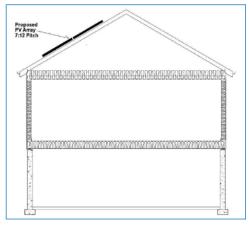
Roof Pitch Detail. The inclination (roof pitch or tilt) for the proposed array location should be detailed in an architectural diagram.
